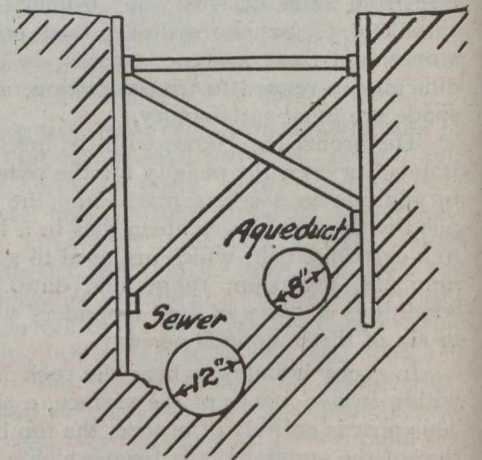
Showing Arrangement of Water and Sewer Pipes
